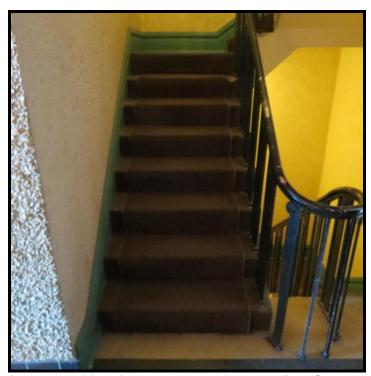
Stairs and railing in the lobby of 1014 King Street, Hamilton –
